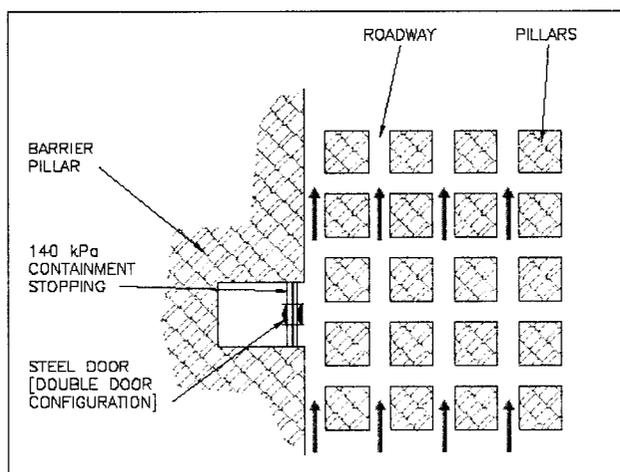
Typical configuration of refuge chamber in rib pillar.
